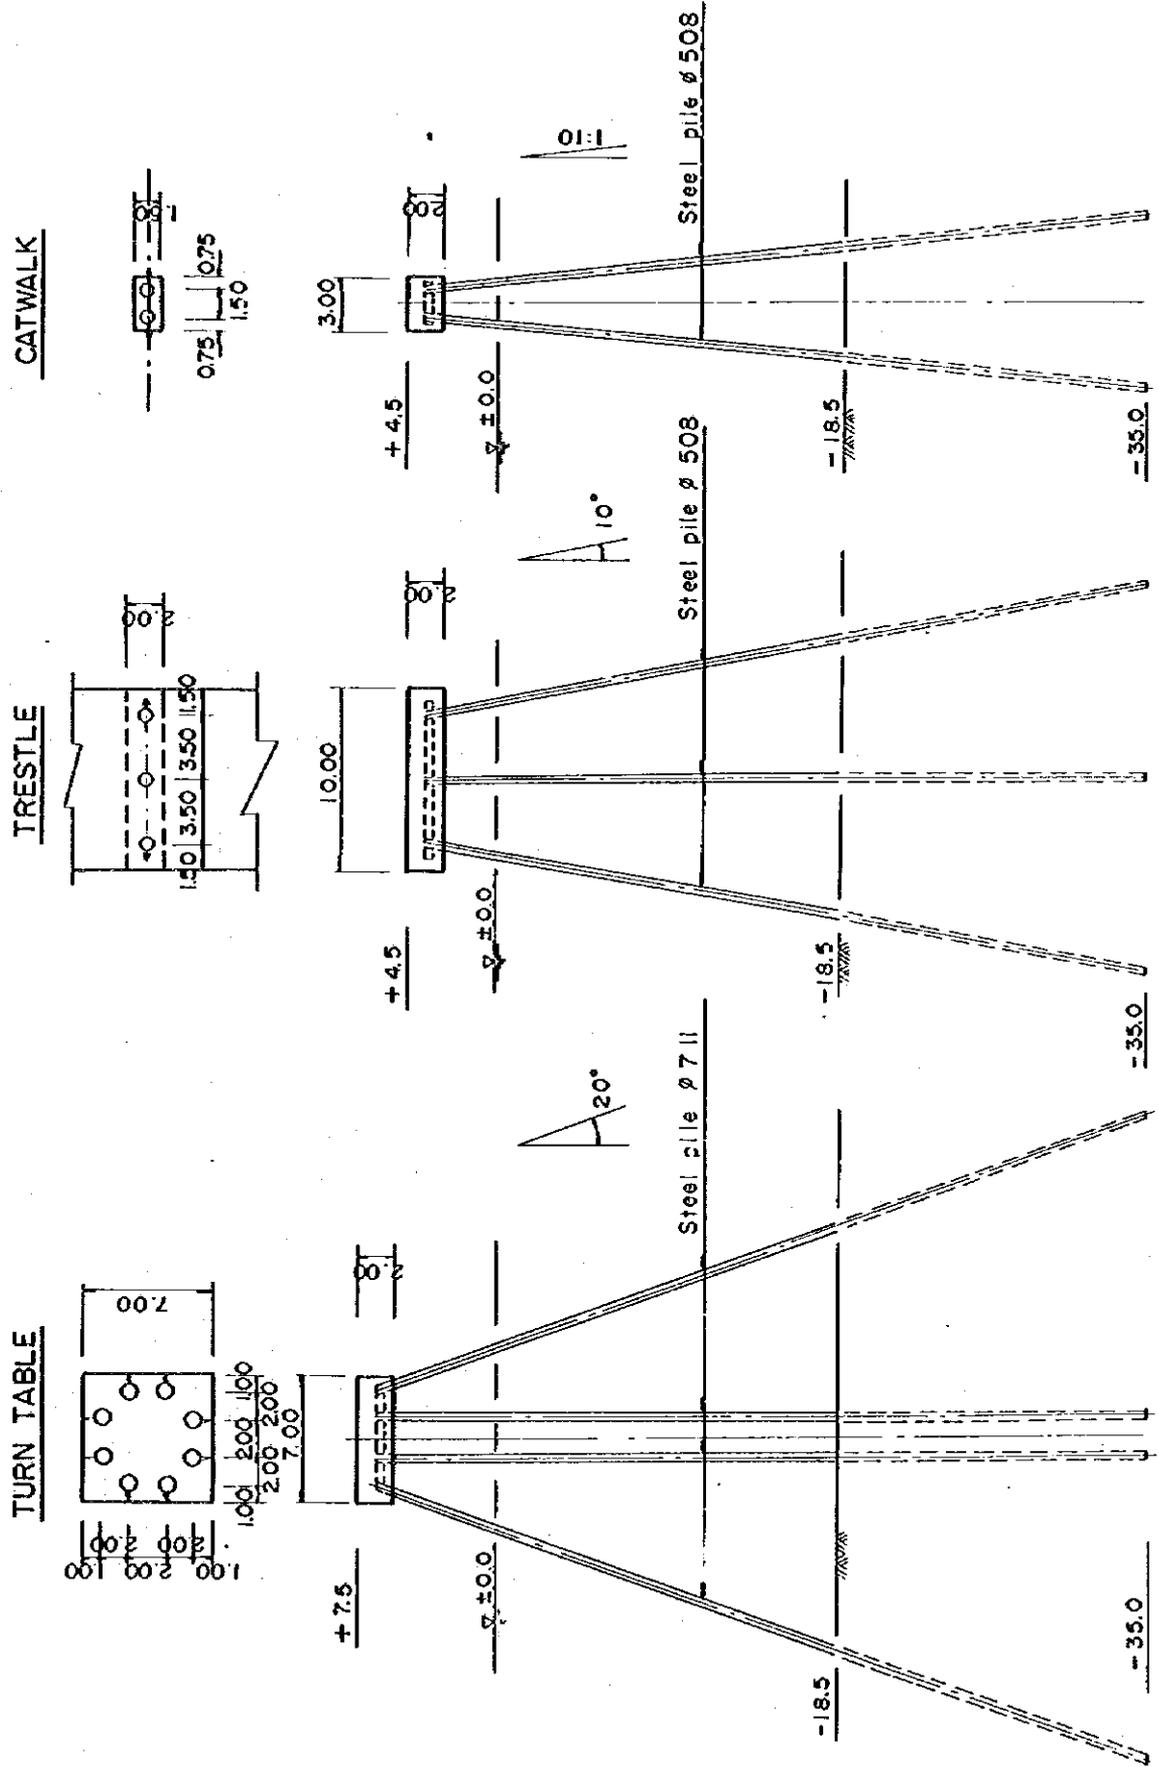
TYPICAL SECTION OF TURN TABLE, TRESTLE AND CATWALK
